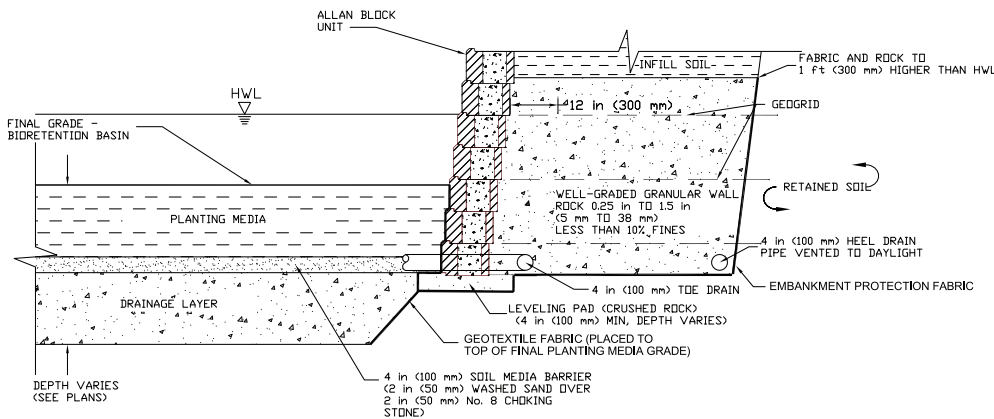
Bio-retention Typical Reinforced Wall Detail High Water Level (HWL)
